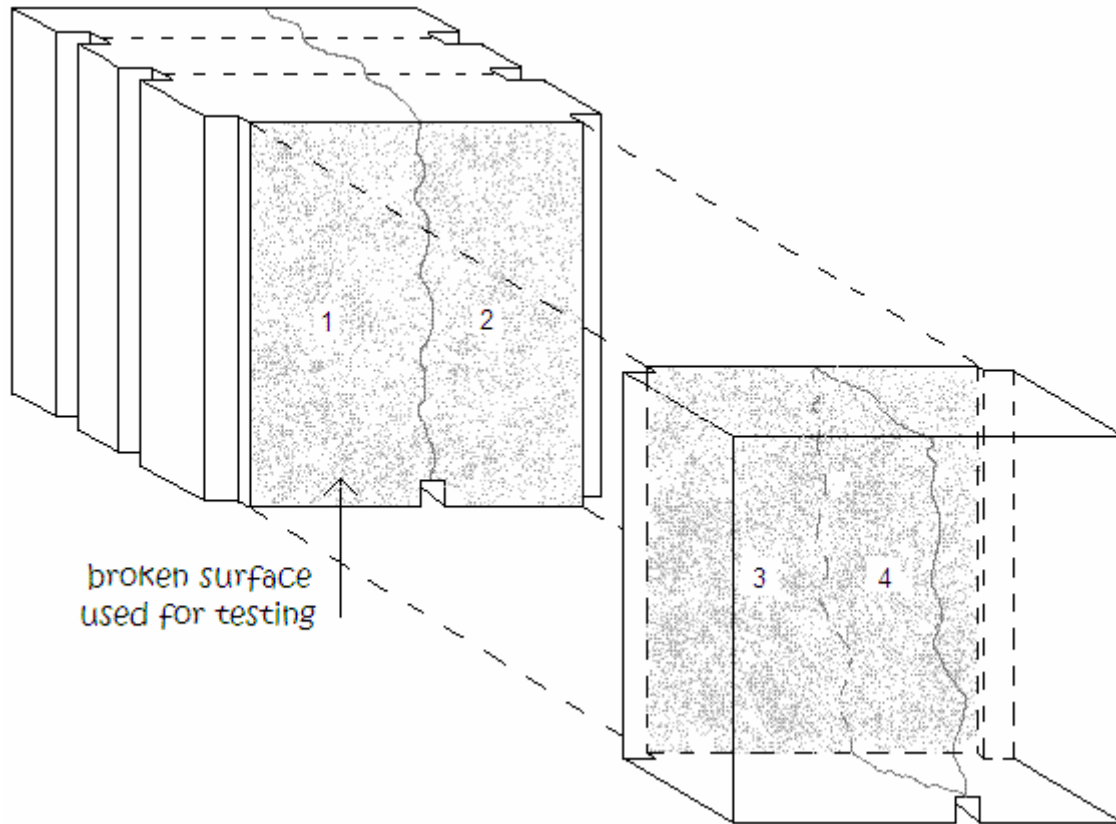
Drawing showing location of testing surface in round 2 samples and numbering the 4 surfaces tested at each break location.
